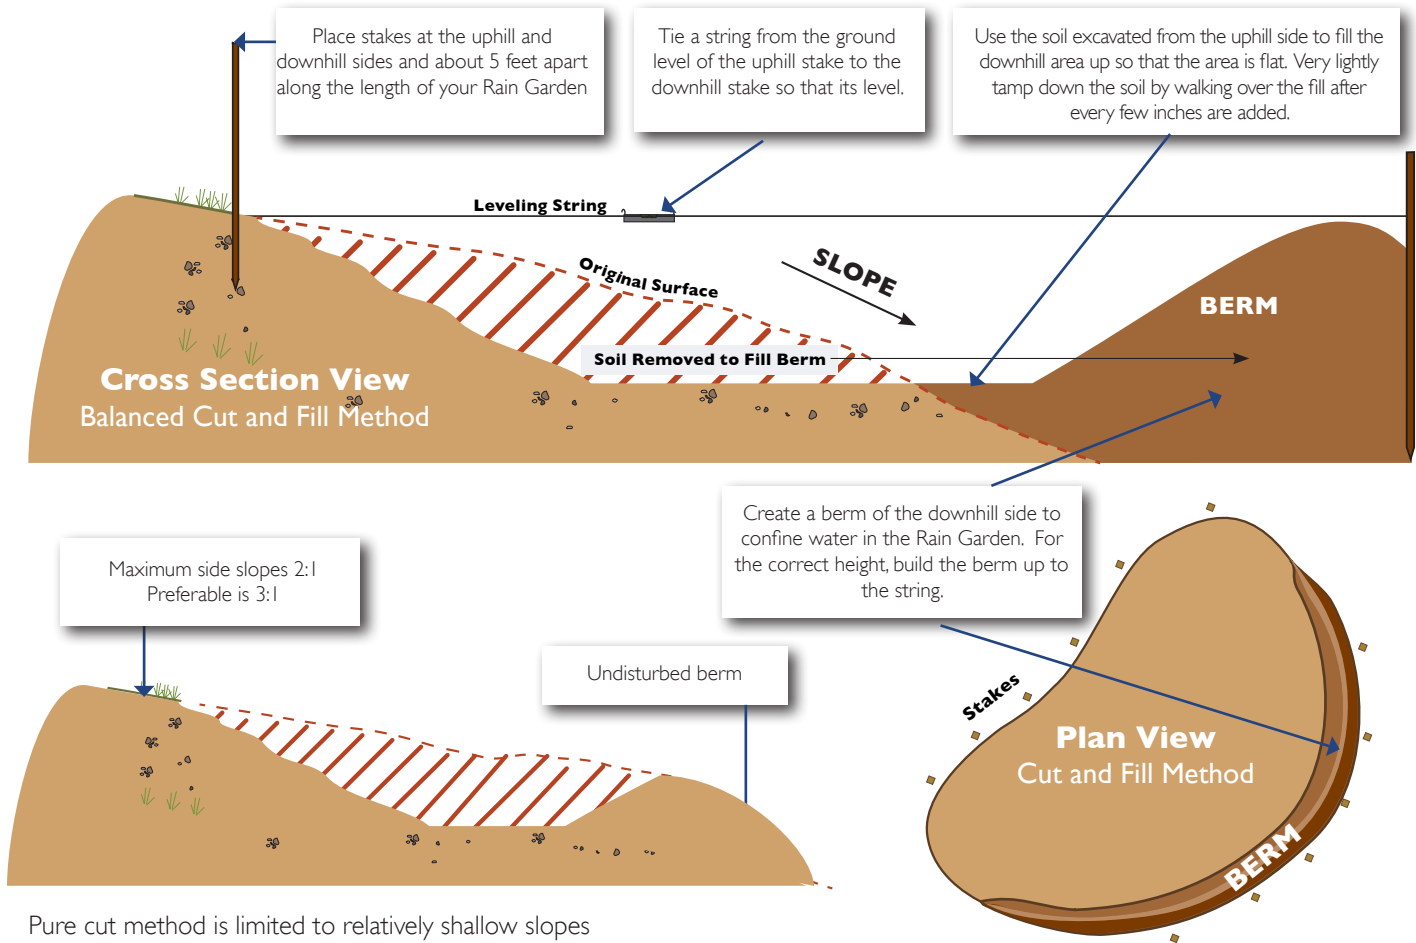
Example of excavation and fill to create a downhill berm to contain the Rain Garden
